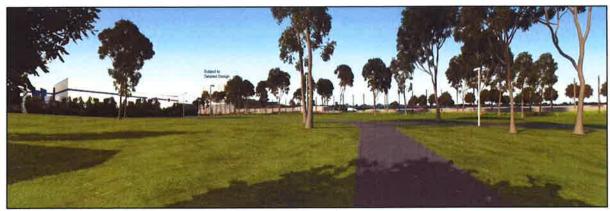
Proposed Transparent Noise Walls (Source: EIS)
